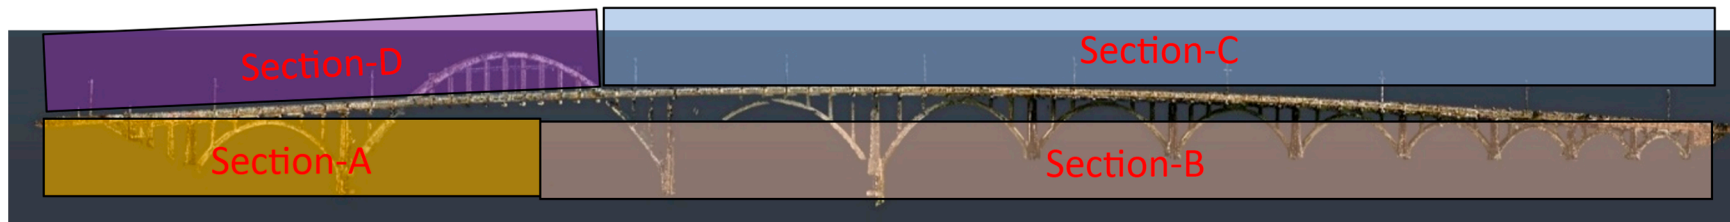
TLS survey phasing plan for Edmund Pettus Bridge.
